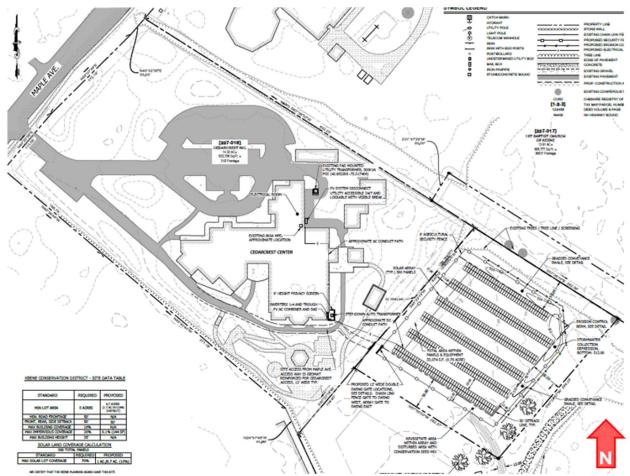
A snippet of the proposed conditions plan showing the proposed location and extent of the solar array on the Cedarcrest site.
